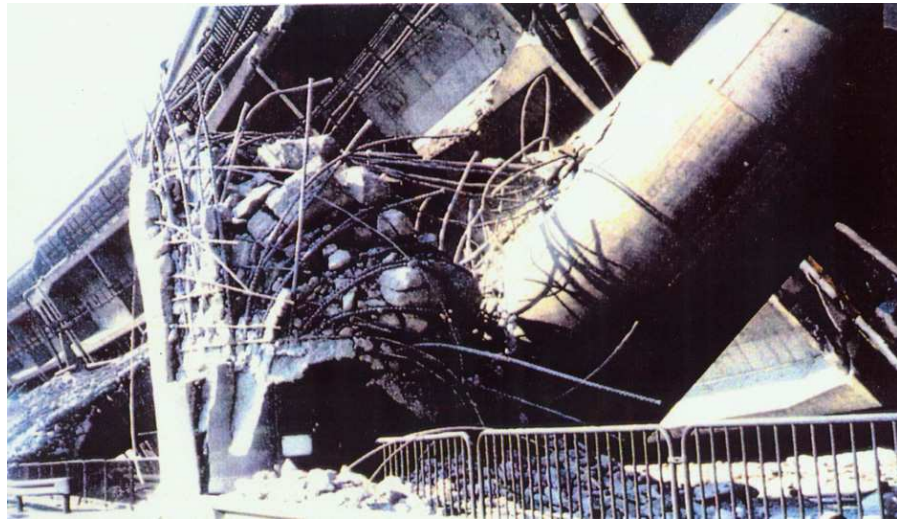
Shear failure of a RC column in the 18-span Fukae Viaduct. Courtesy of Center for Advanced Engineering Structural Assessment and Research, Japan.
